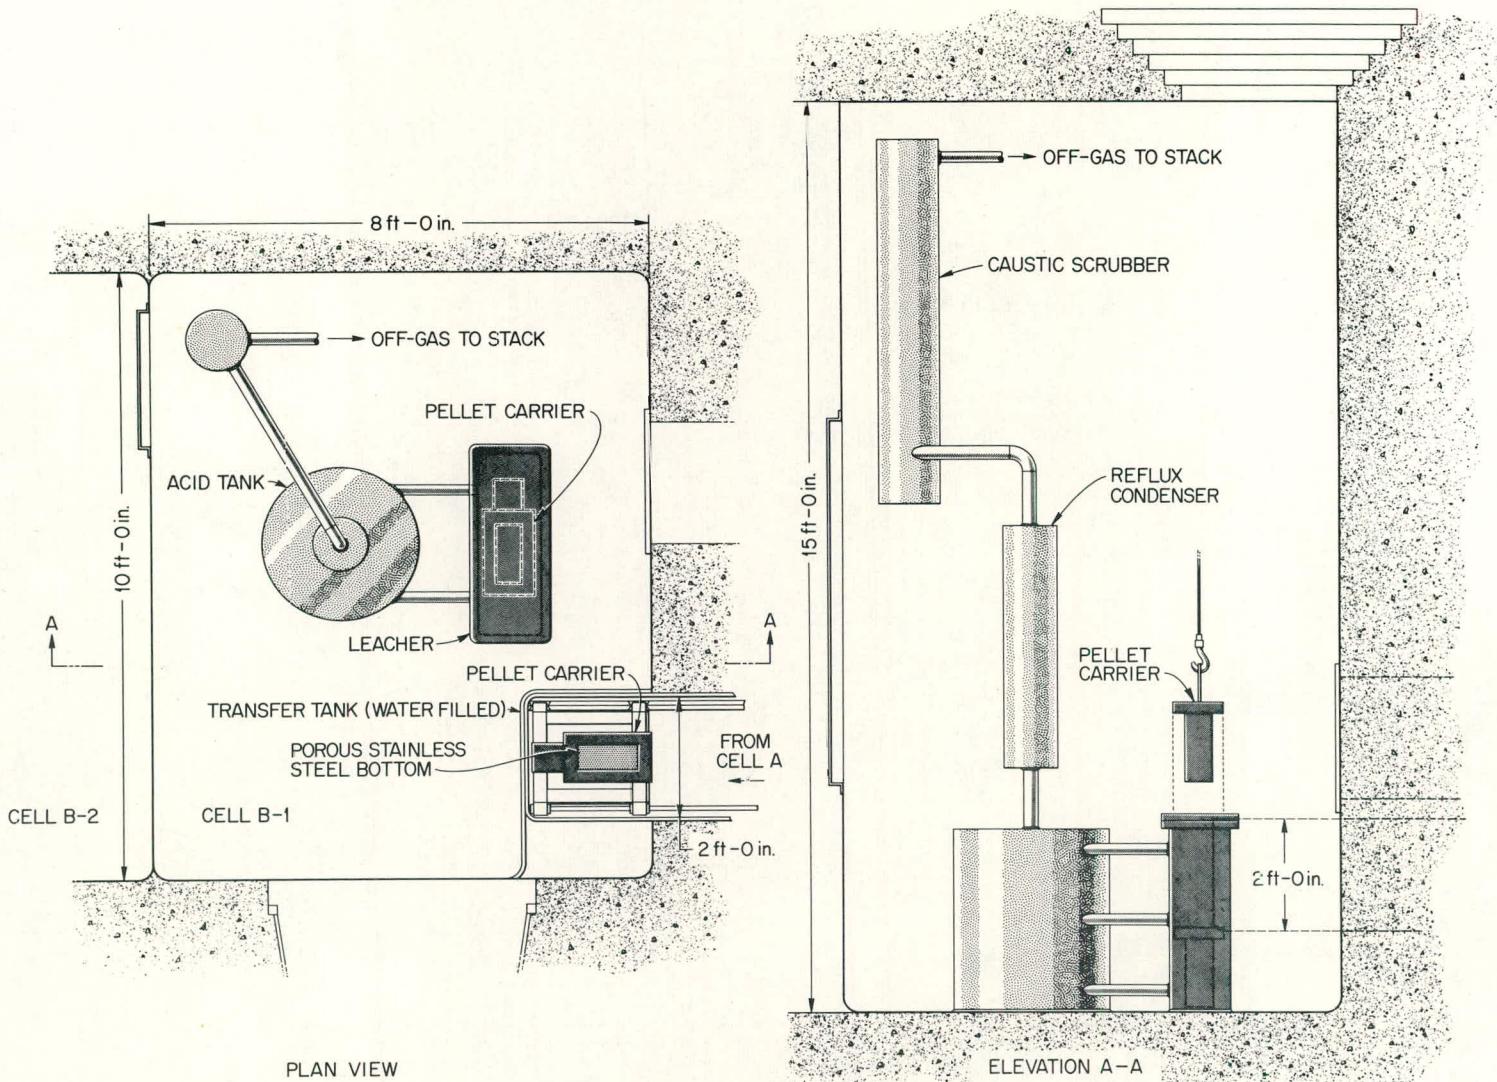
Proposed Installation in Segmenting Facility - Bldg. 3026 Plan and Elevation View - Cell "B" (Leach Facility).
